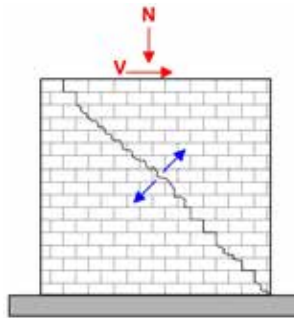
Failure mechanism due to shear driven traction : diagonal cracks in the prevalent compressive direction.
